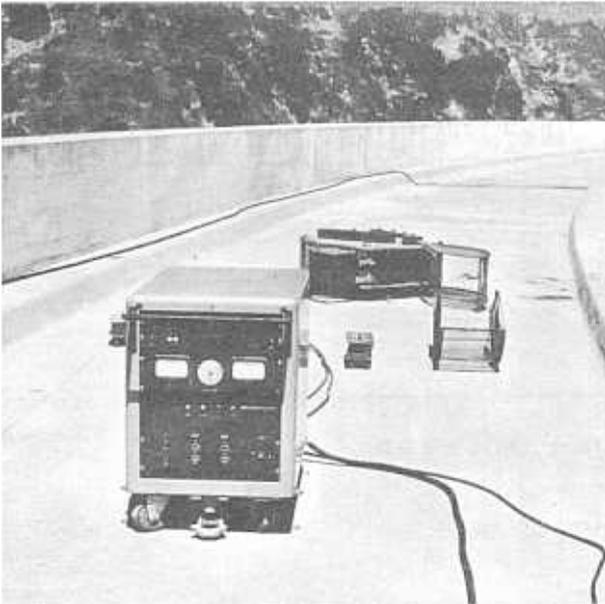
Shaker and slave console 60 feet to left of crown cantilever.
